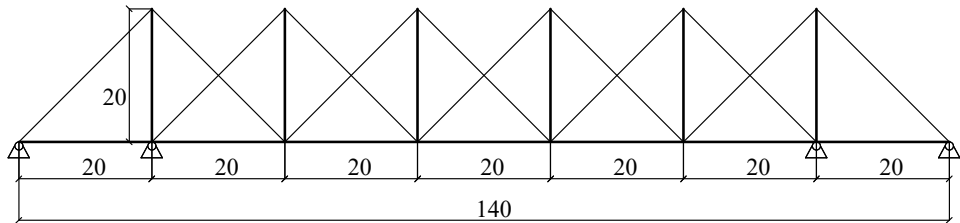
Equal pylons bridge [m] (made by the author)
